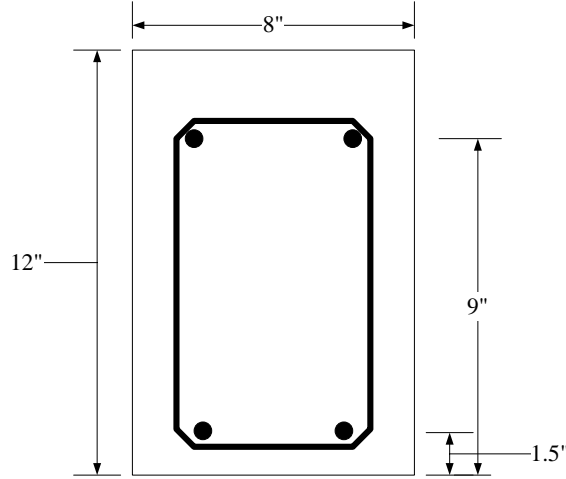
Cross-sectional dimensions and position of steel reinforcing.
